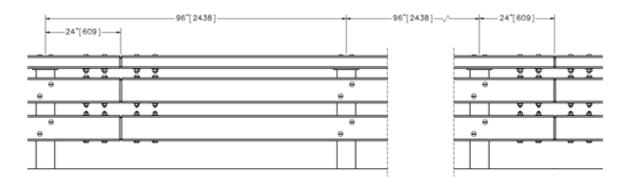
Location of Splice Tubes for Full-Scale Crash Tests
